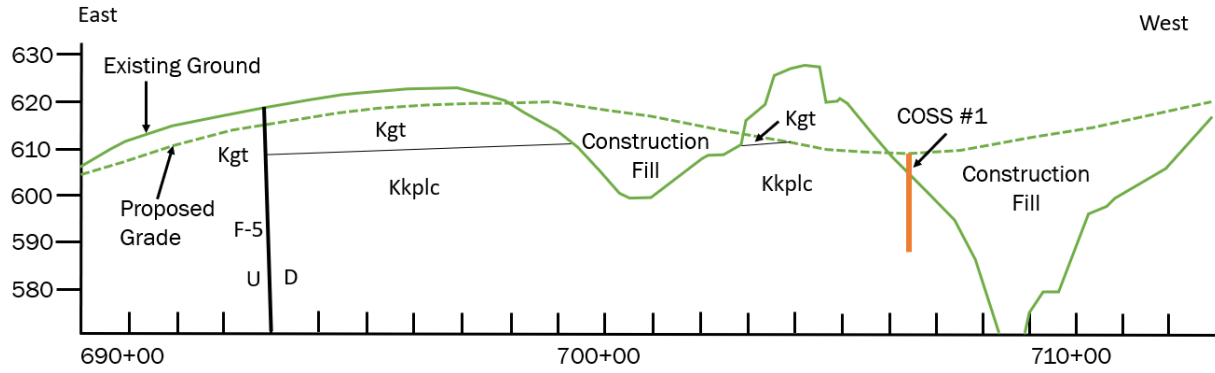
As built southbound main lanes profile along MoPac stationing from 1978 (CSJ: 3136-01-027). Drilled shaft COSS #1 (orange), an excavation site within karst zone 1, would penetrate the Leached and Collapsed Member (Kkplc) of the Edwards Group. Elevations are shown in feet above mean sea level; VE=10x. During high-flow conditions at Barton Springs, the water table elevation is 476 ft amsl.
